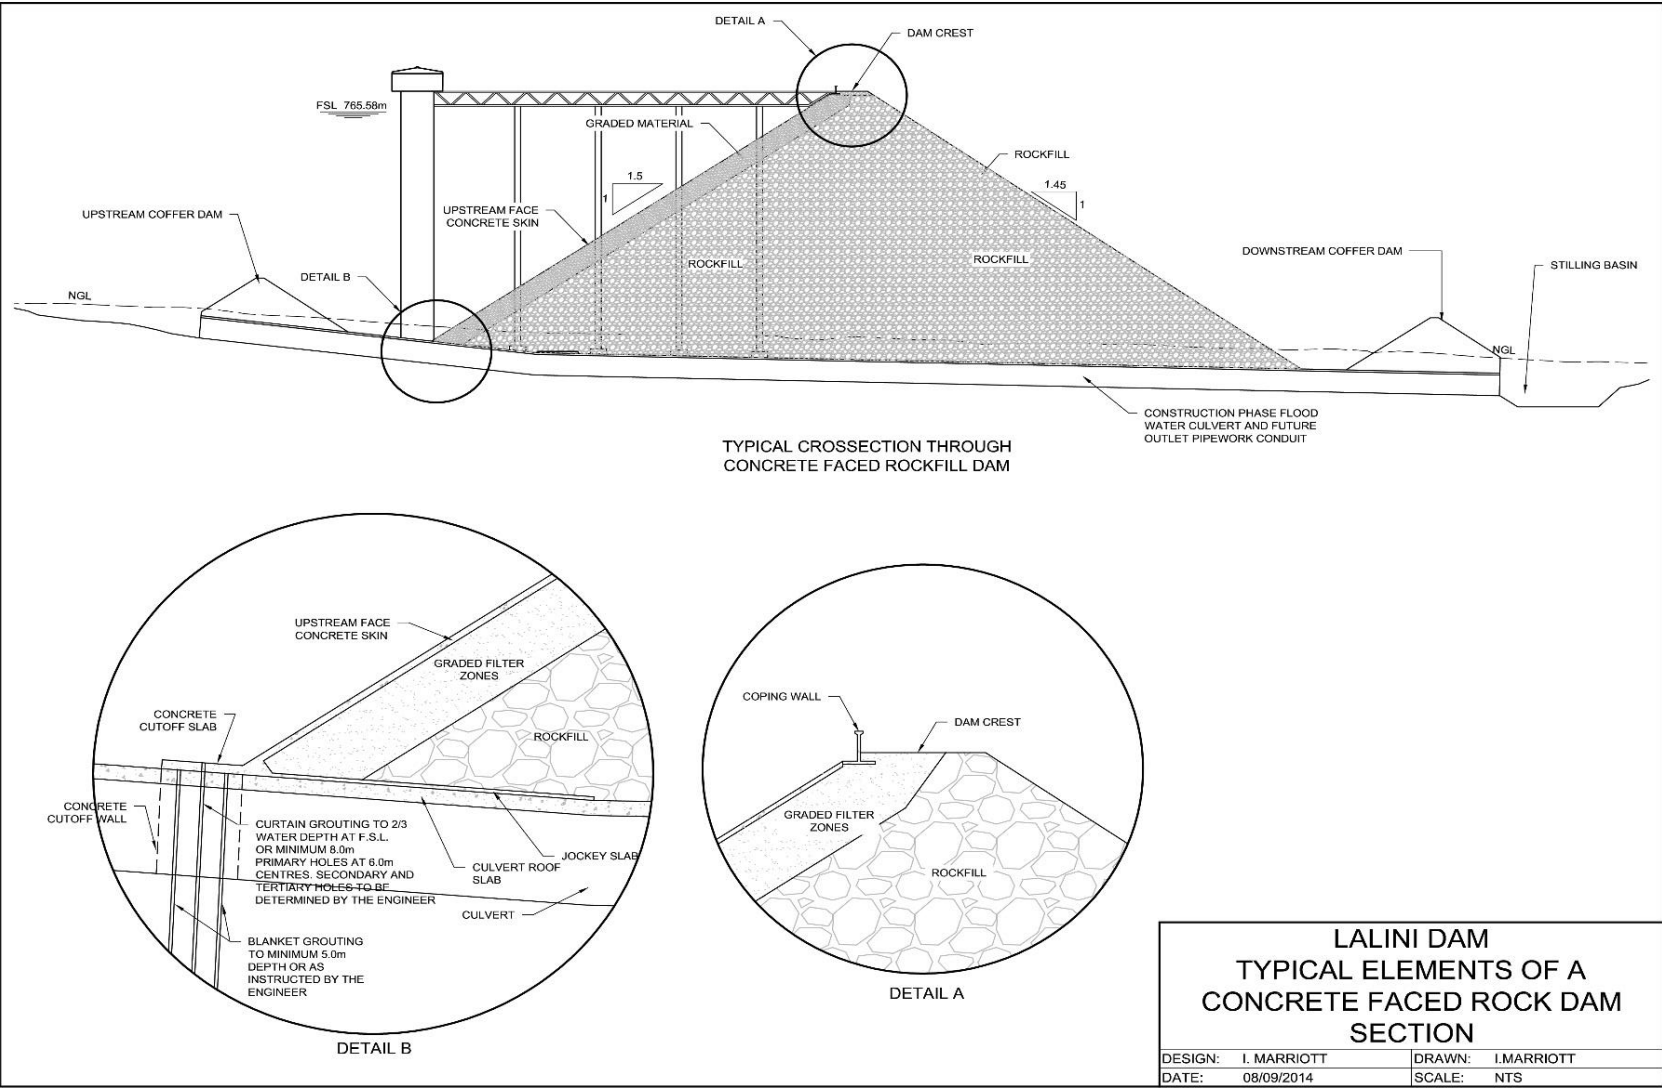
Typical Sections and Details for CFRD Type Dam
